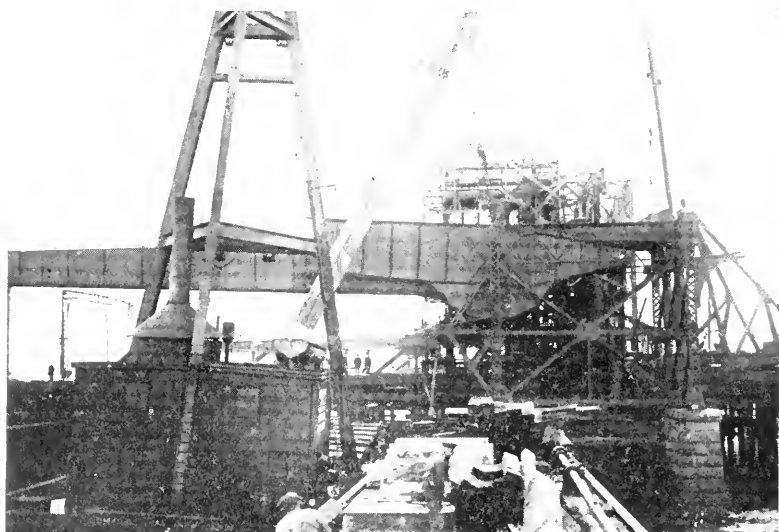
ERECTING SEGMENTAL SECTION OF RAILWAY DRAW SPAN.
